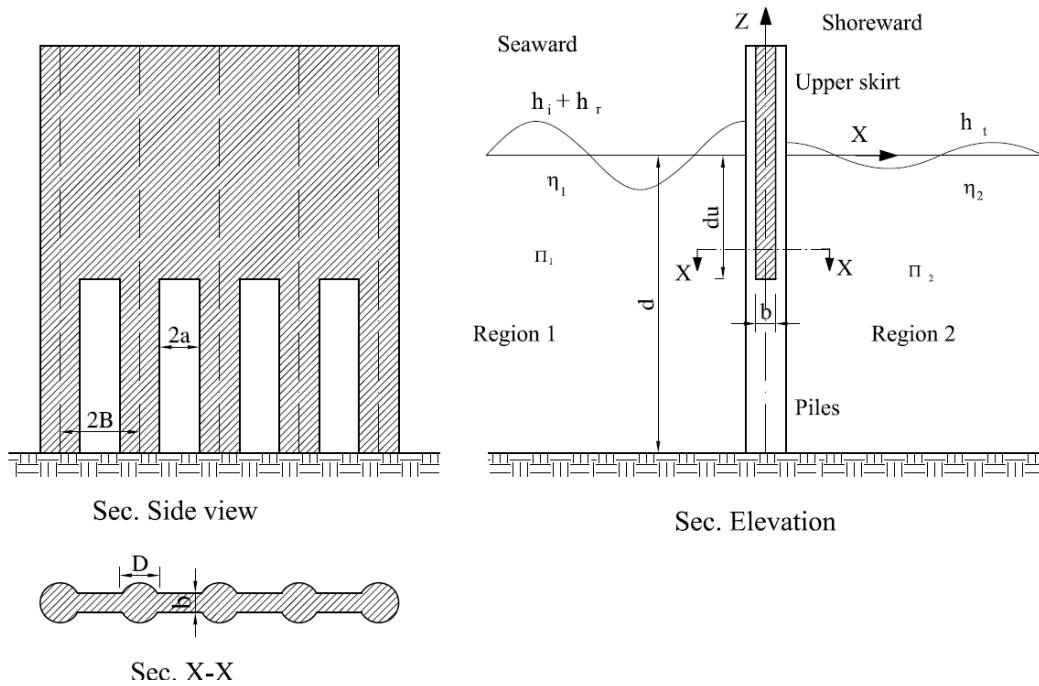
Circular piles supported vertical wall breakwater. [72 - Suh, 2007]
